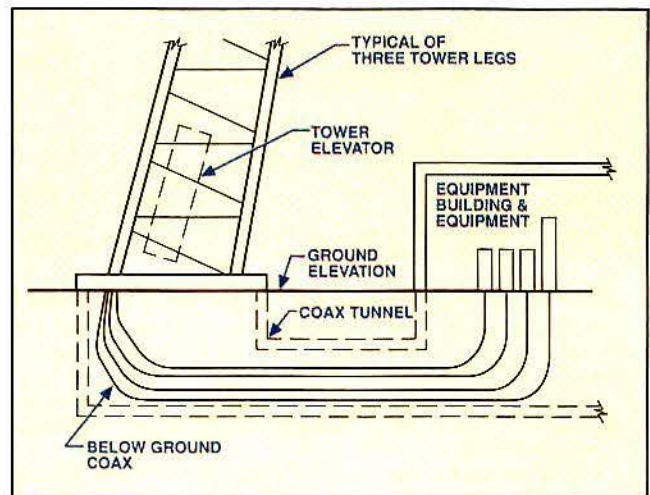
Where they are routed between the tower legs and the transmitter building, the coaxial cables are protected by tunnels.
